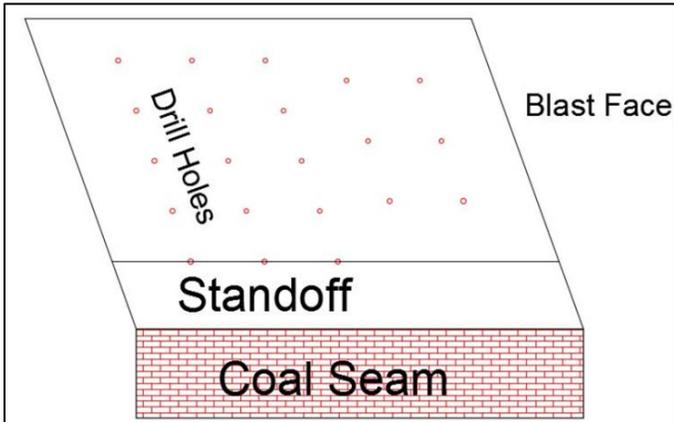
A cross-sectional concept drawing of how a hybrid cast blast is drilled.
